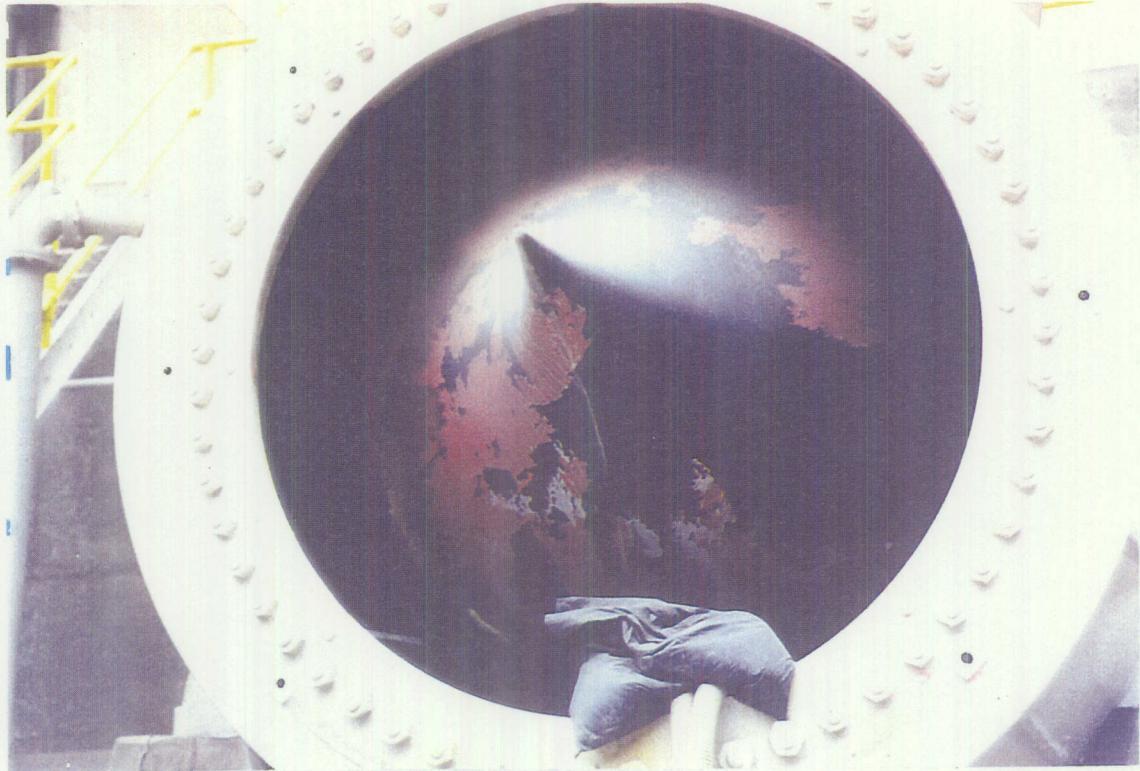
Morris Dam - Needle Valve 1 - View of needle and downstream flange.
